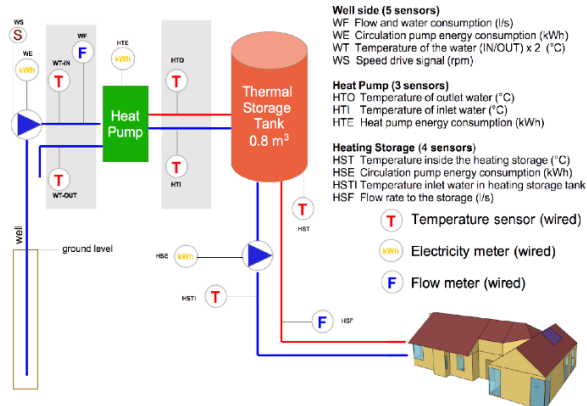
Heat system design and sensor metering (Pallonetto et al. 2016)
